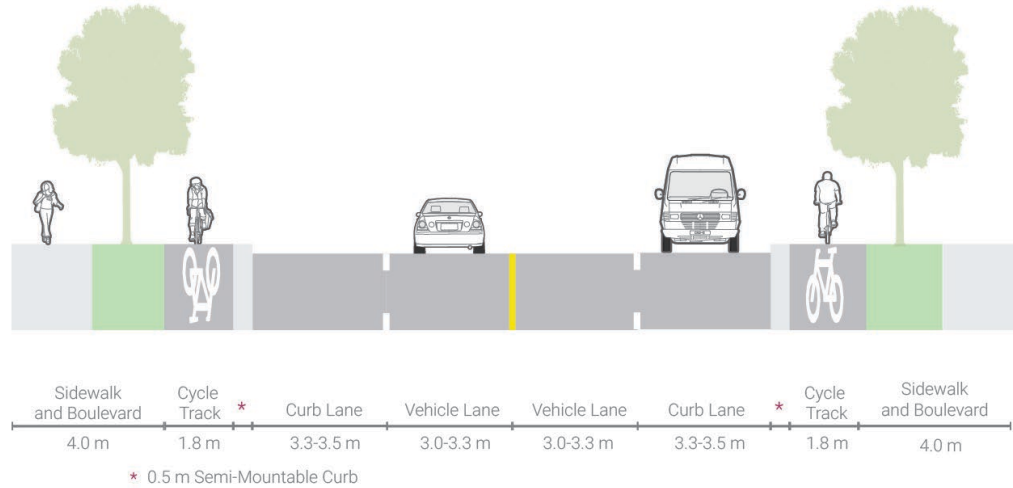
ARTERIAL ROAD CONCEPTUAL CROSS-SECTION
